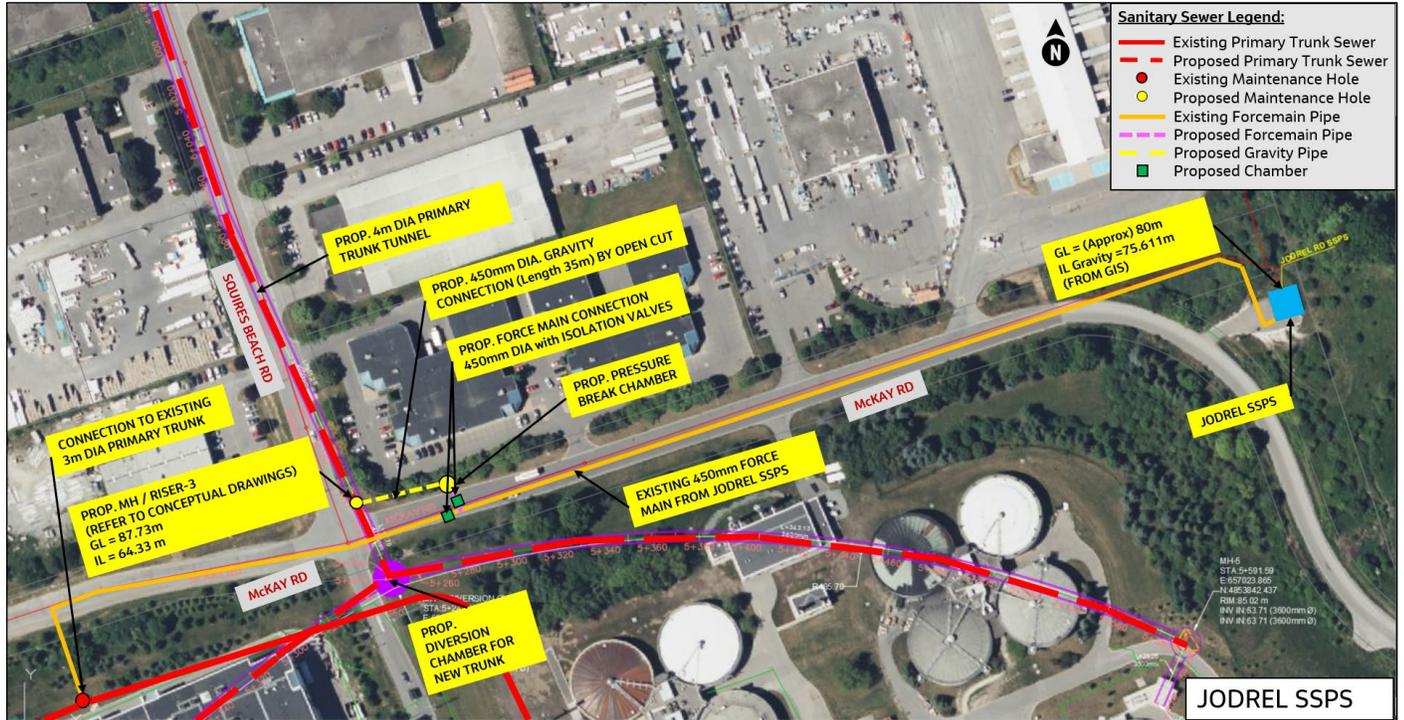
Connection of Jodrel SPS to the Proposed Primary Trunk Sewer
